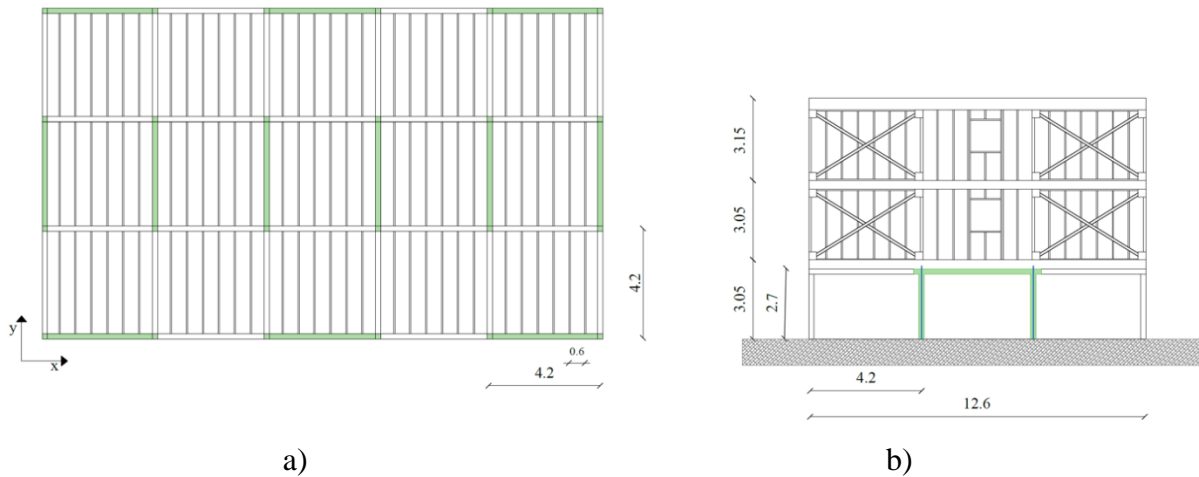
Building configuration: a) plan, b) and elevation in y-direction (unit: m).
